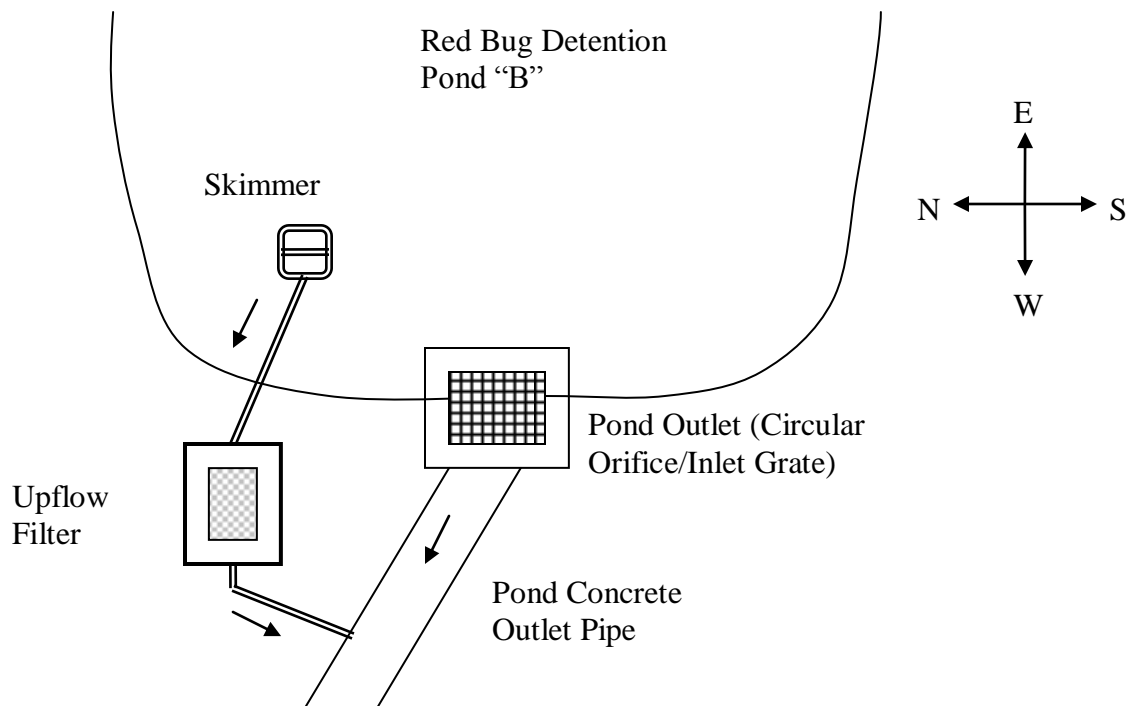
Plan View of Red Bug Pond B in Seminole County (N.T.S.)
